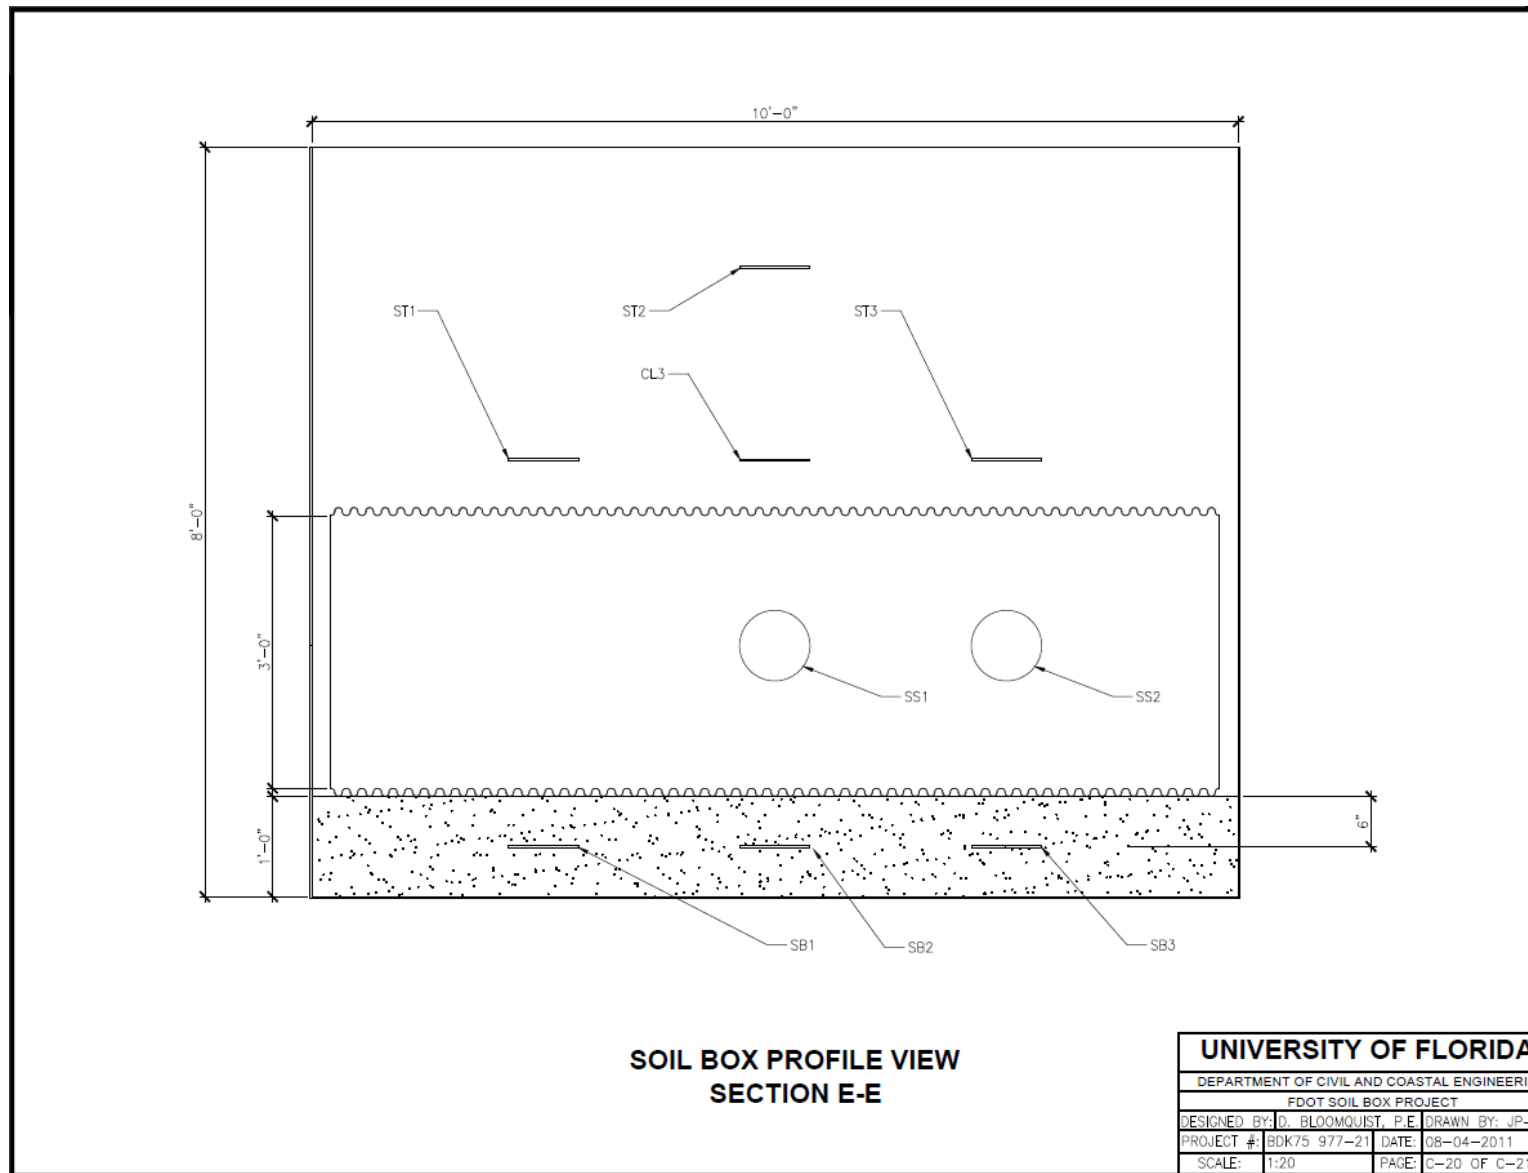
Earth pressure cell layout for PVC pipe test, section E-E.
